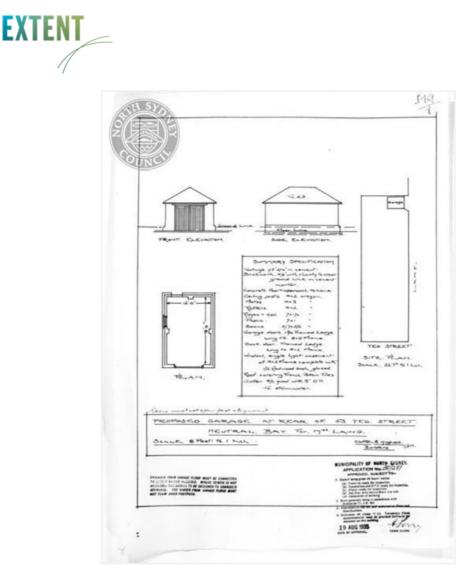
Plan submitted to Council in August 1935, for a new garage facing the side lane, built by Clapton & Hughes, builders (Source: Stanton Image Gallery, Call No. BA 35/281).
